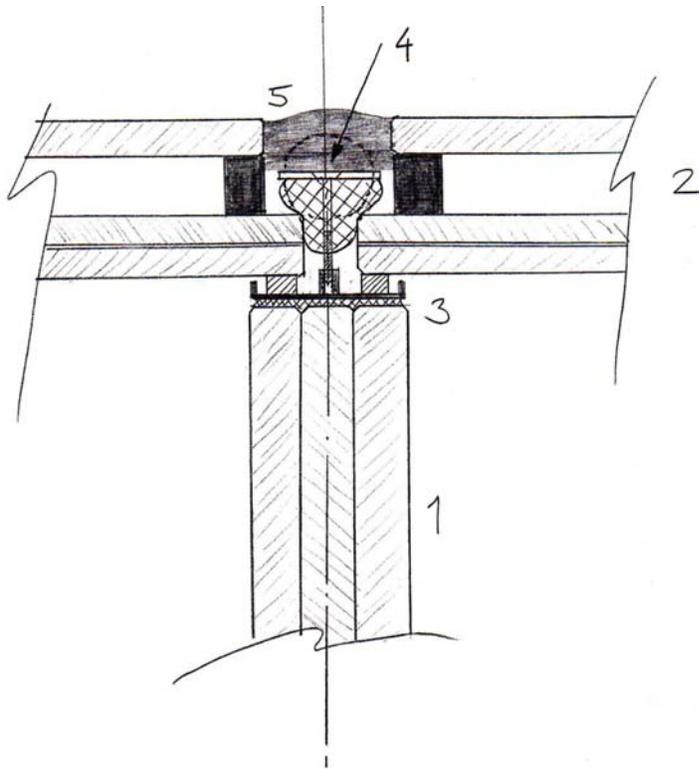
Connection Detail for Glass Beam to Insulated Glass Panel (Nijssse 24)
